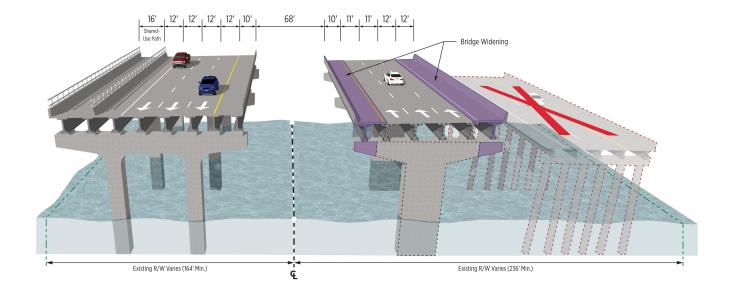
Segment 2 - Typical Section 4 Bridges over Old Tampa Bay
